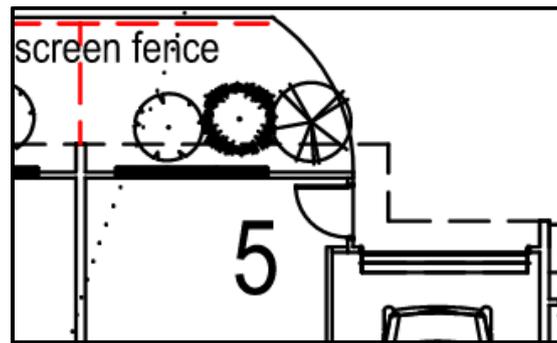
Unit 5 site plan for 21 Coleman Street, Moonah.
